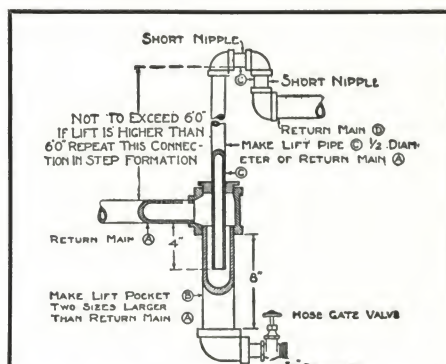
Showing How Lift Connection in Vacuum Return Main Larger Than 2-in. May Be Built of Pipe and Fittings
